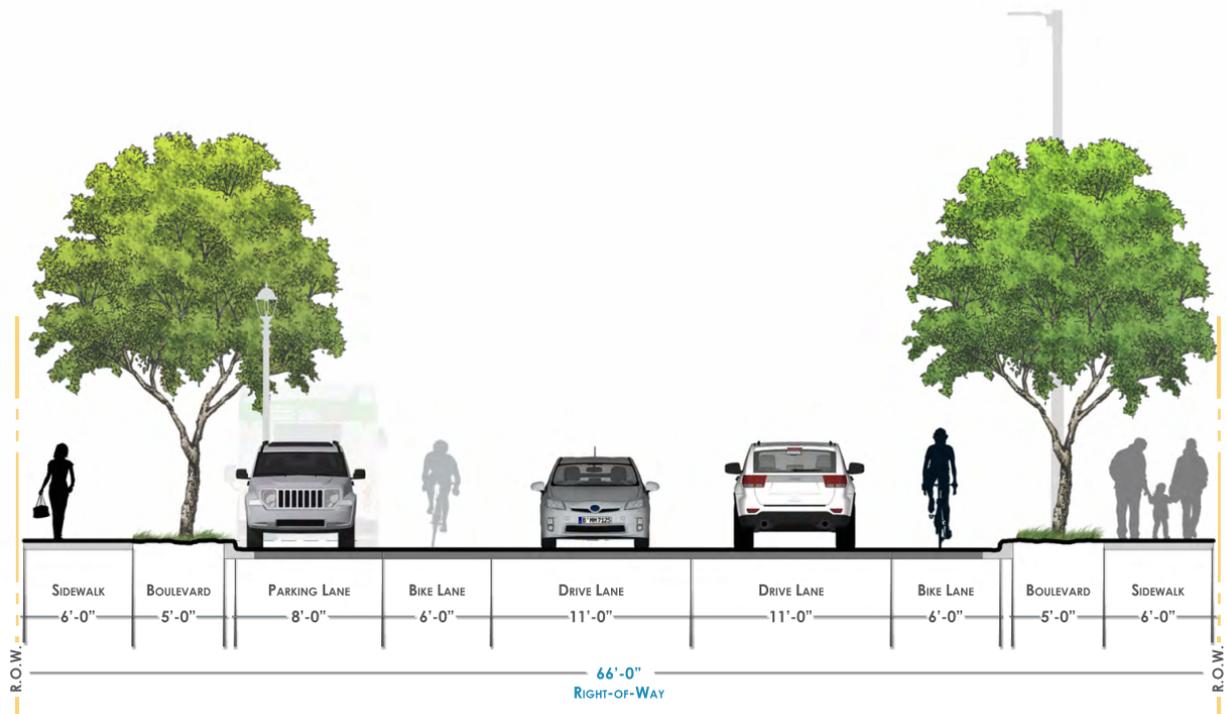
On-Street Bike Lane Alternative C (Looking North)
